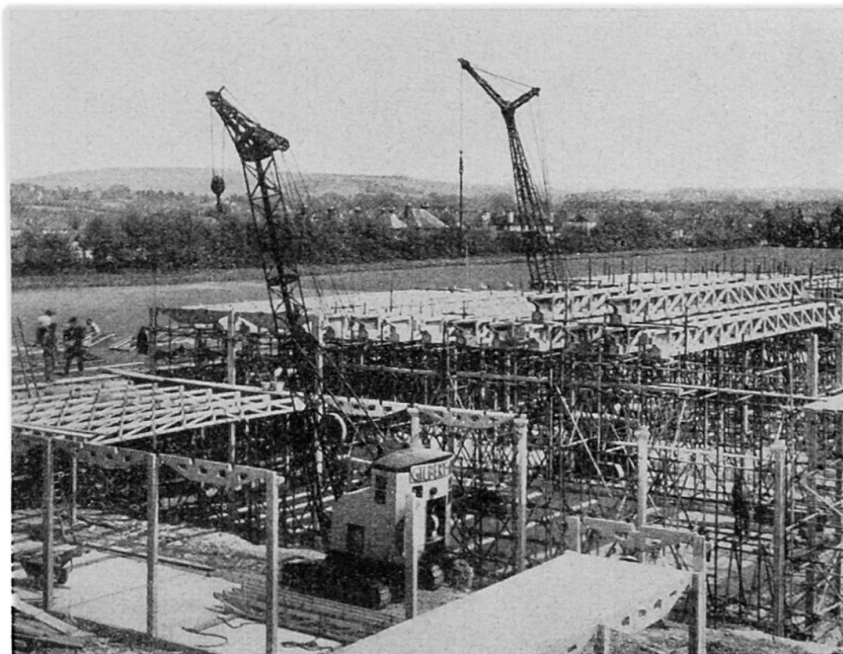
Precast concrete units of the Intergrid system for Worthing Secondary Technical School.
